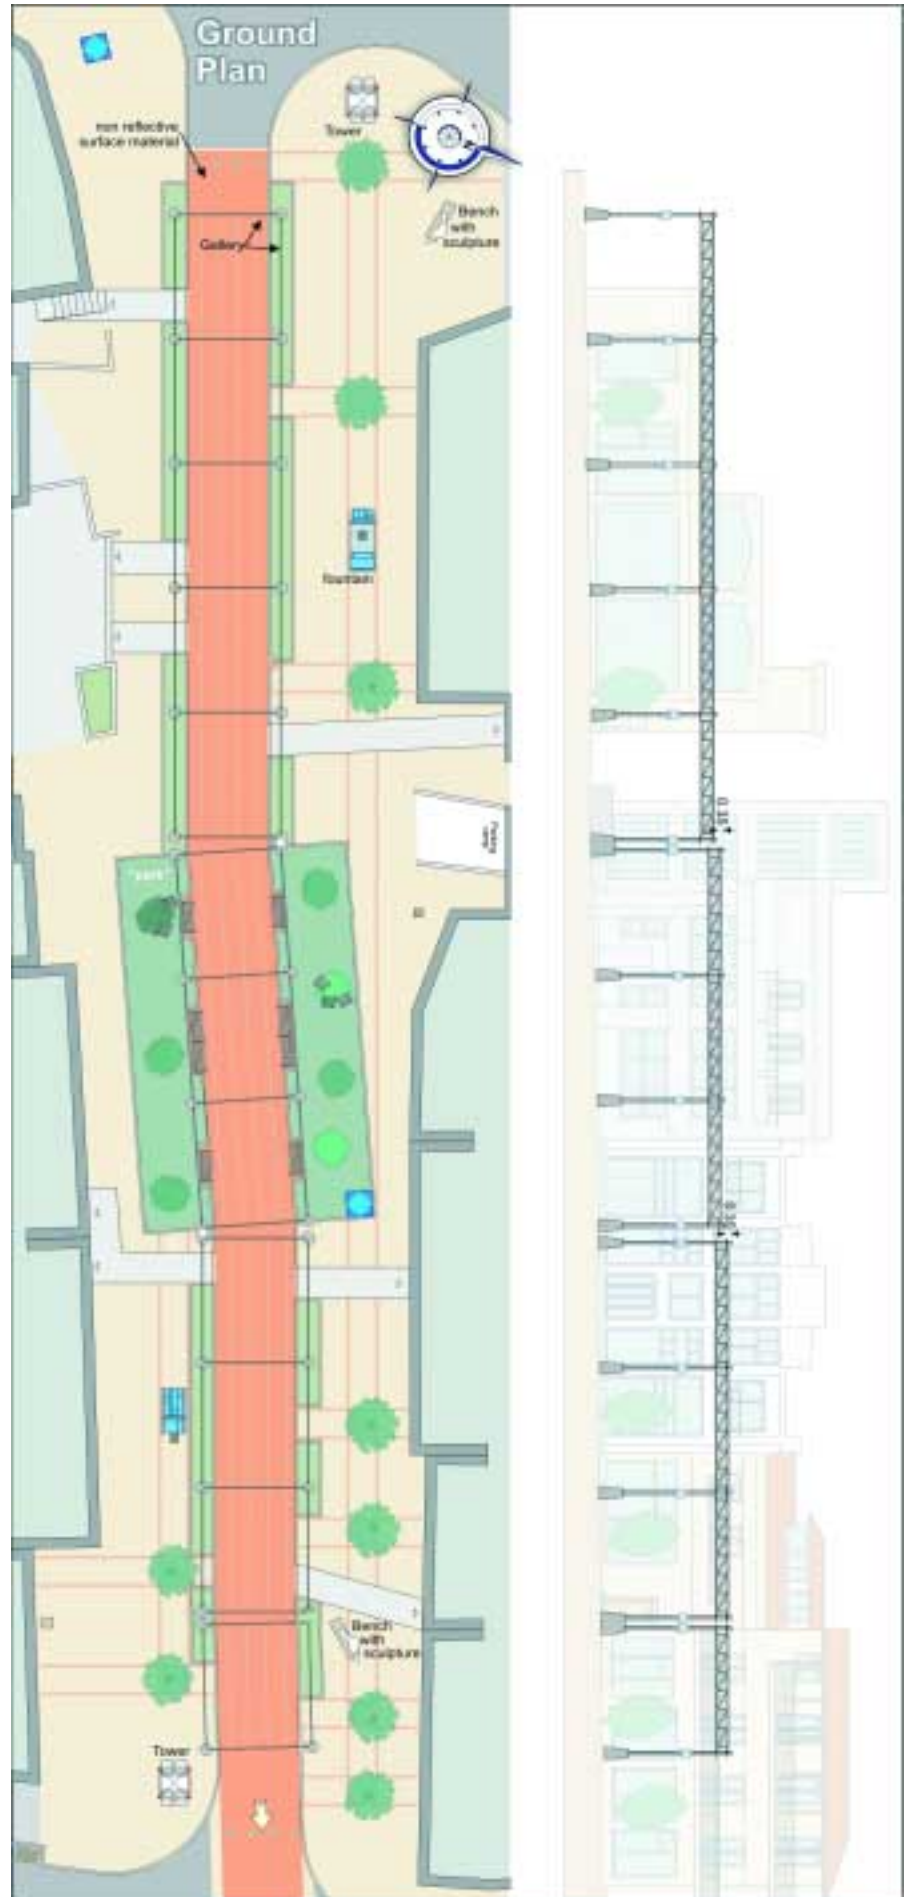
Plan view and cross section of the design proposal (part of the street).
